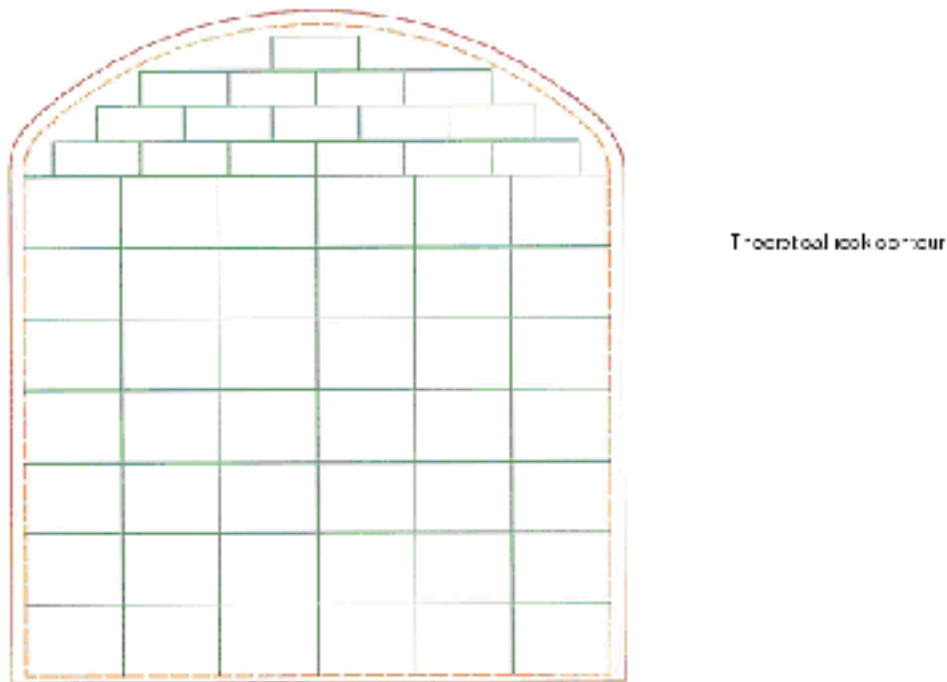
The blocks placed in the idealized tunnel cross section.
